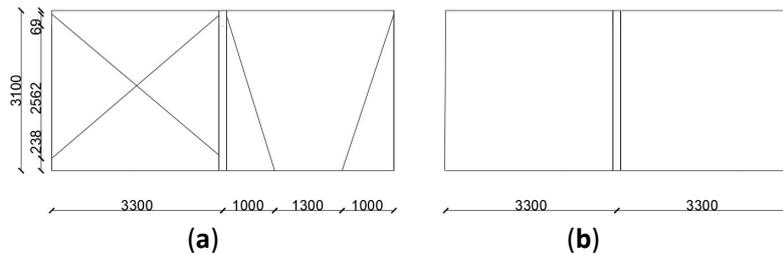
Variant 2.1 Strips: (a) Front facade, (b) Back facade.
